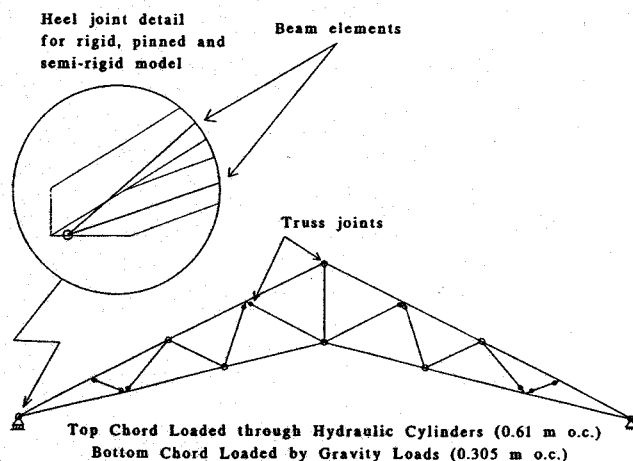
Geometric layout of a 2-D model of the scissors truss.
